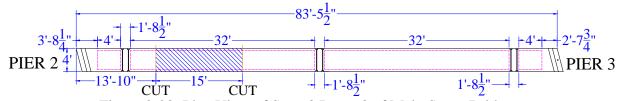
Plan View of Span 3 Beam 3 of Main Street Bridge
